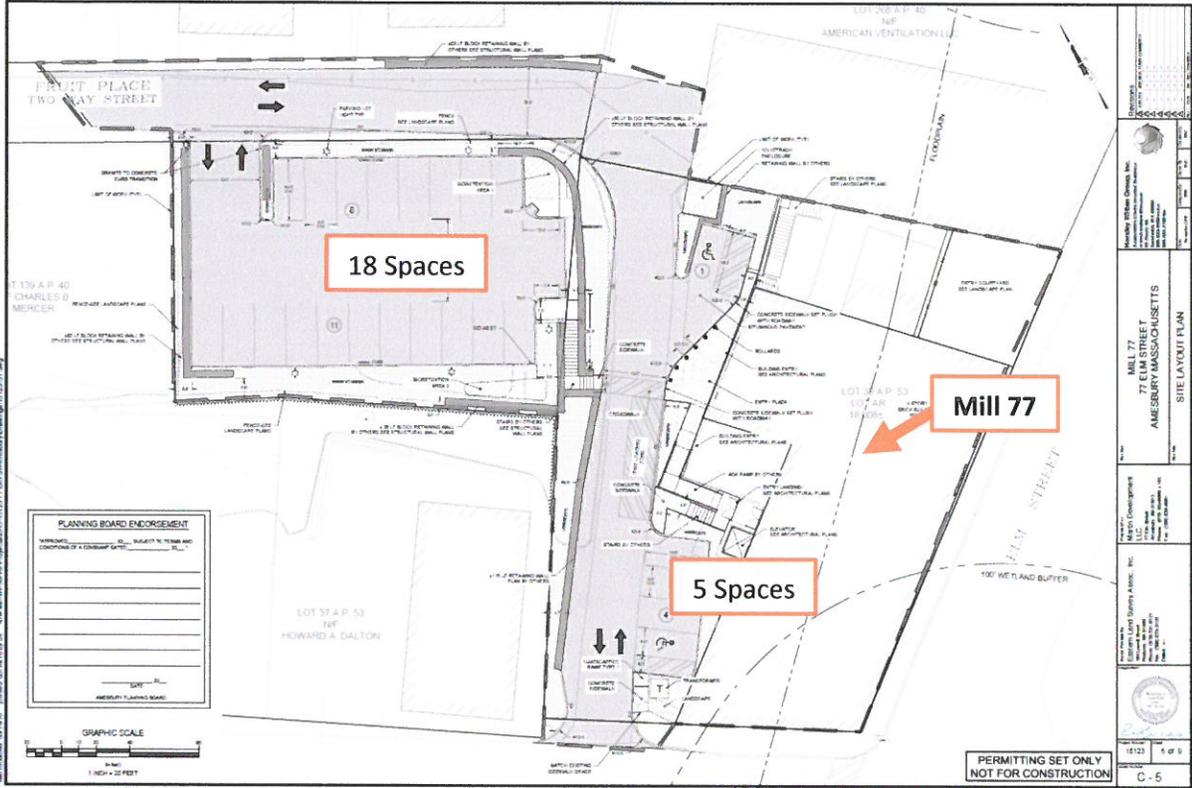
Proposed Private On-Site Off-Street Parking for Mill77
